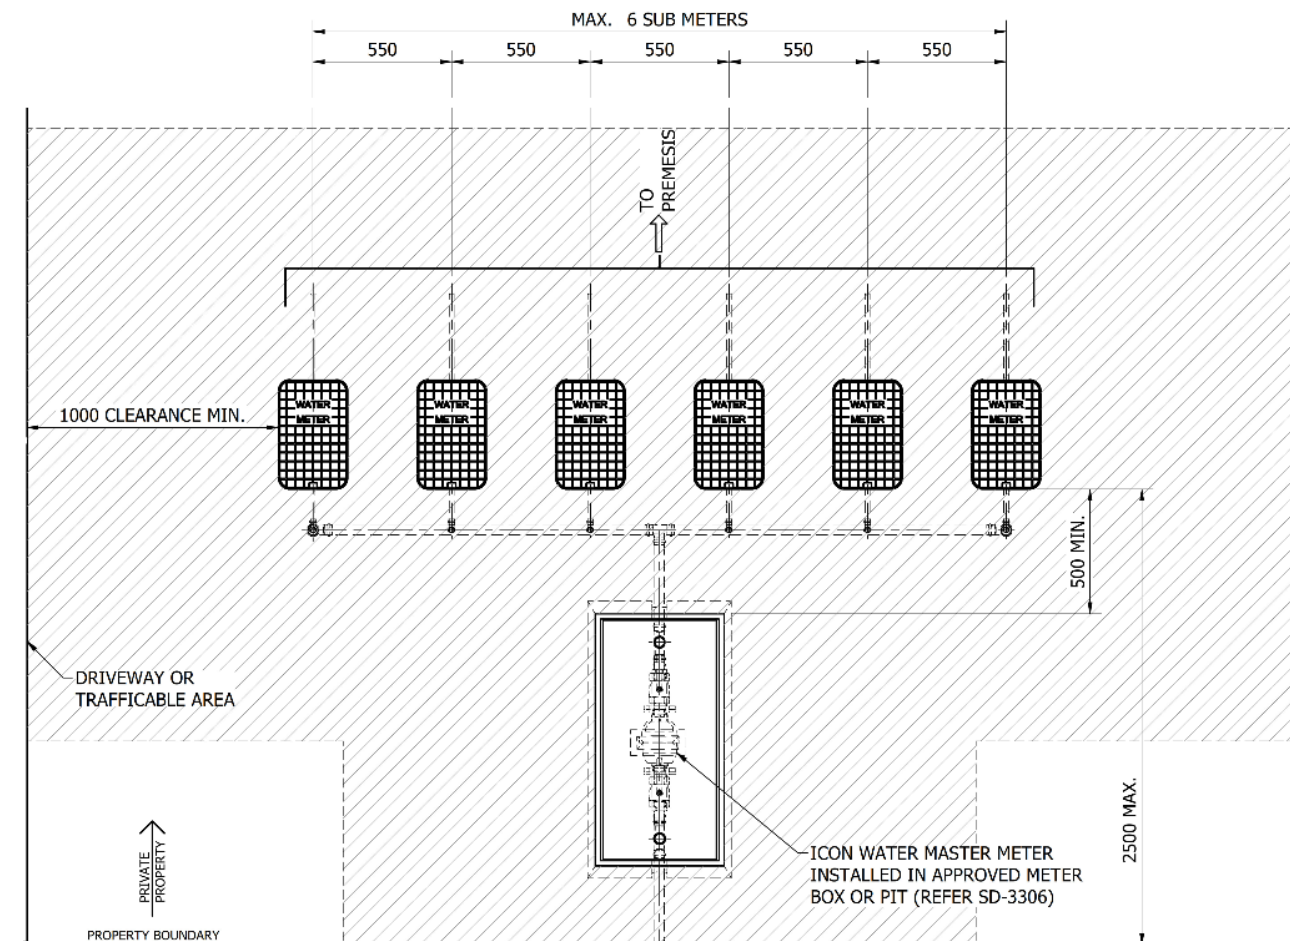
Typical Sub-Meter box assemblies – plan view
